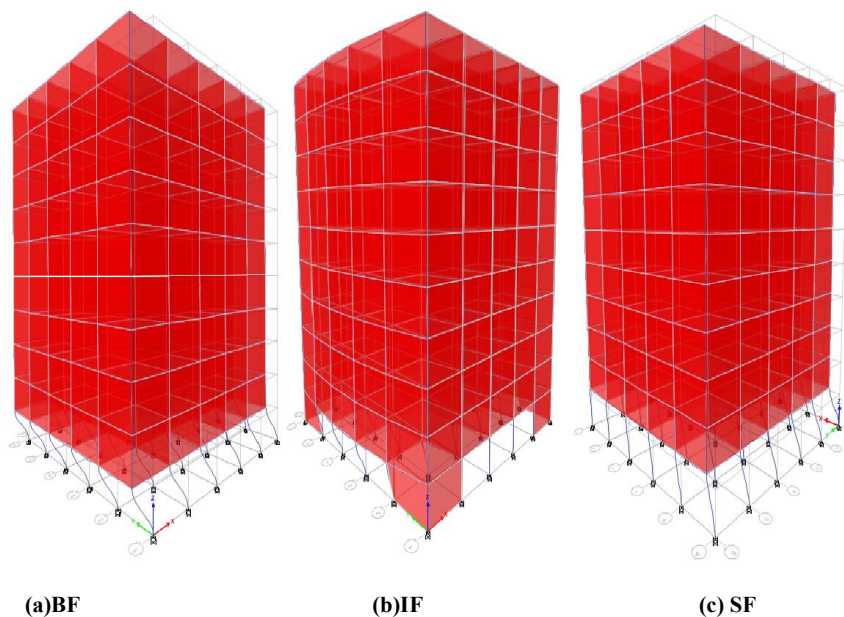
Deformed Shape of the Frames to Lateral Loading
